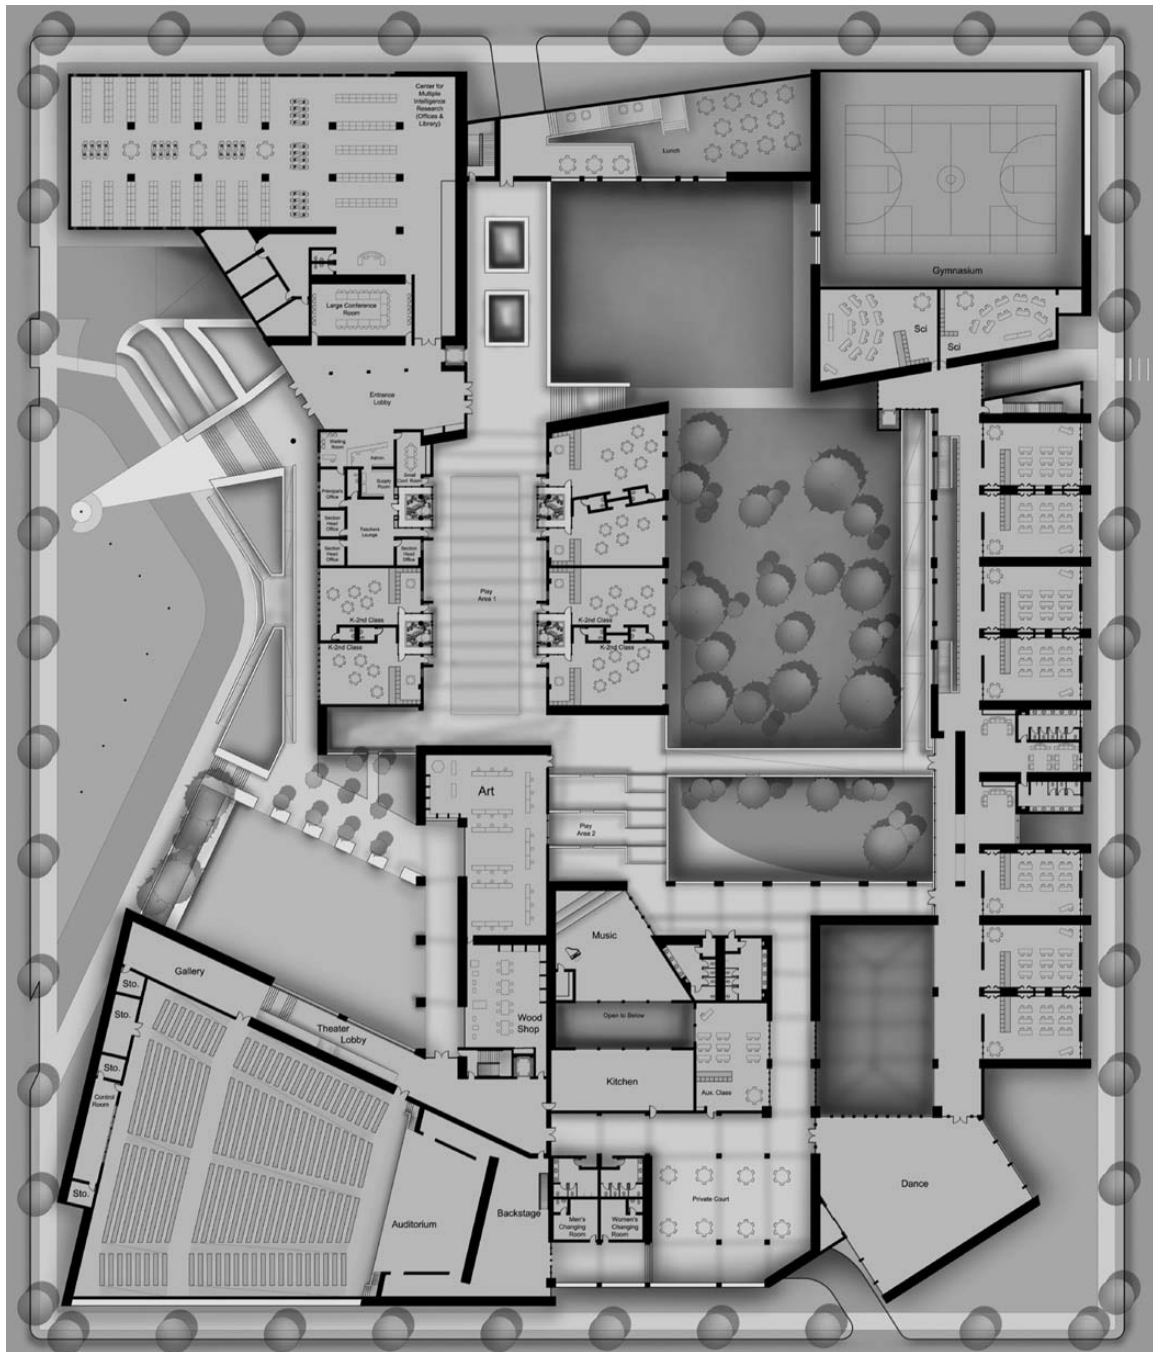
Main Floor of Proposed New School of Orlando Campus
